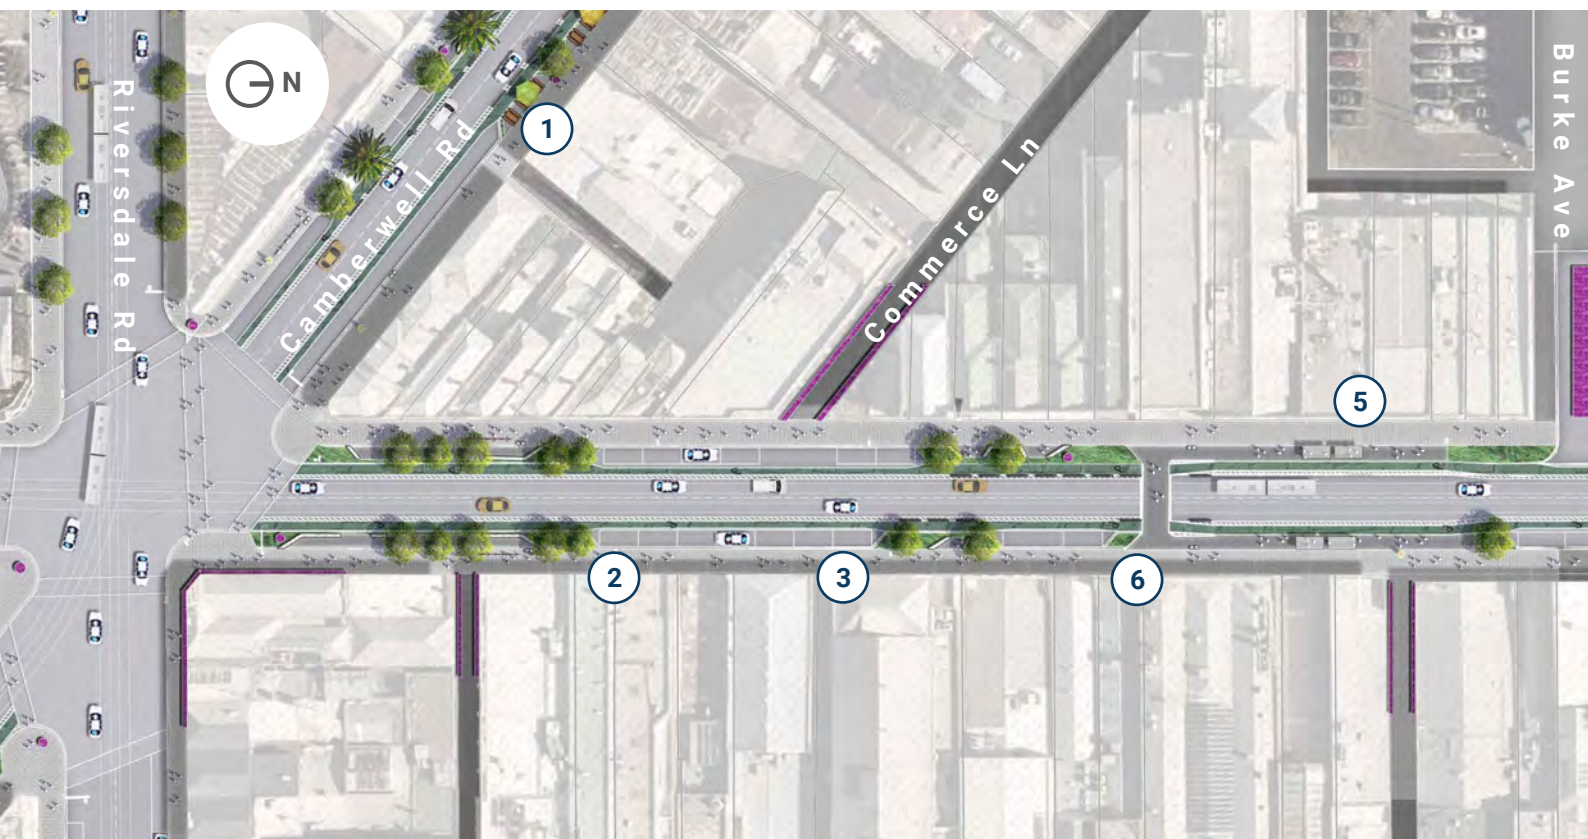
Burke Junction streetscape concept plan (indicative only).
